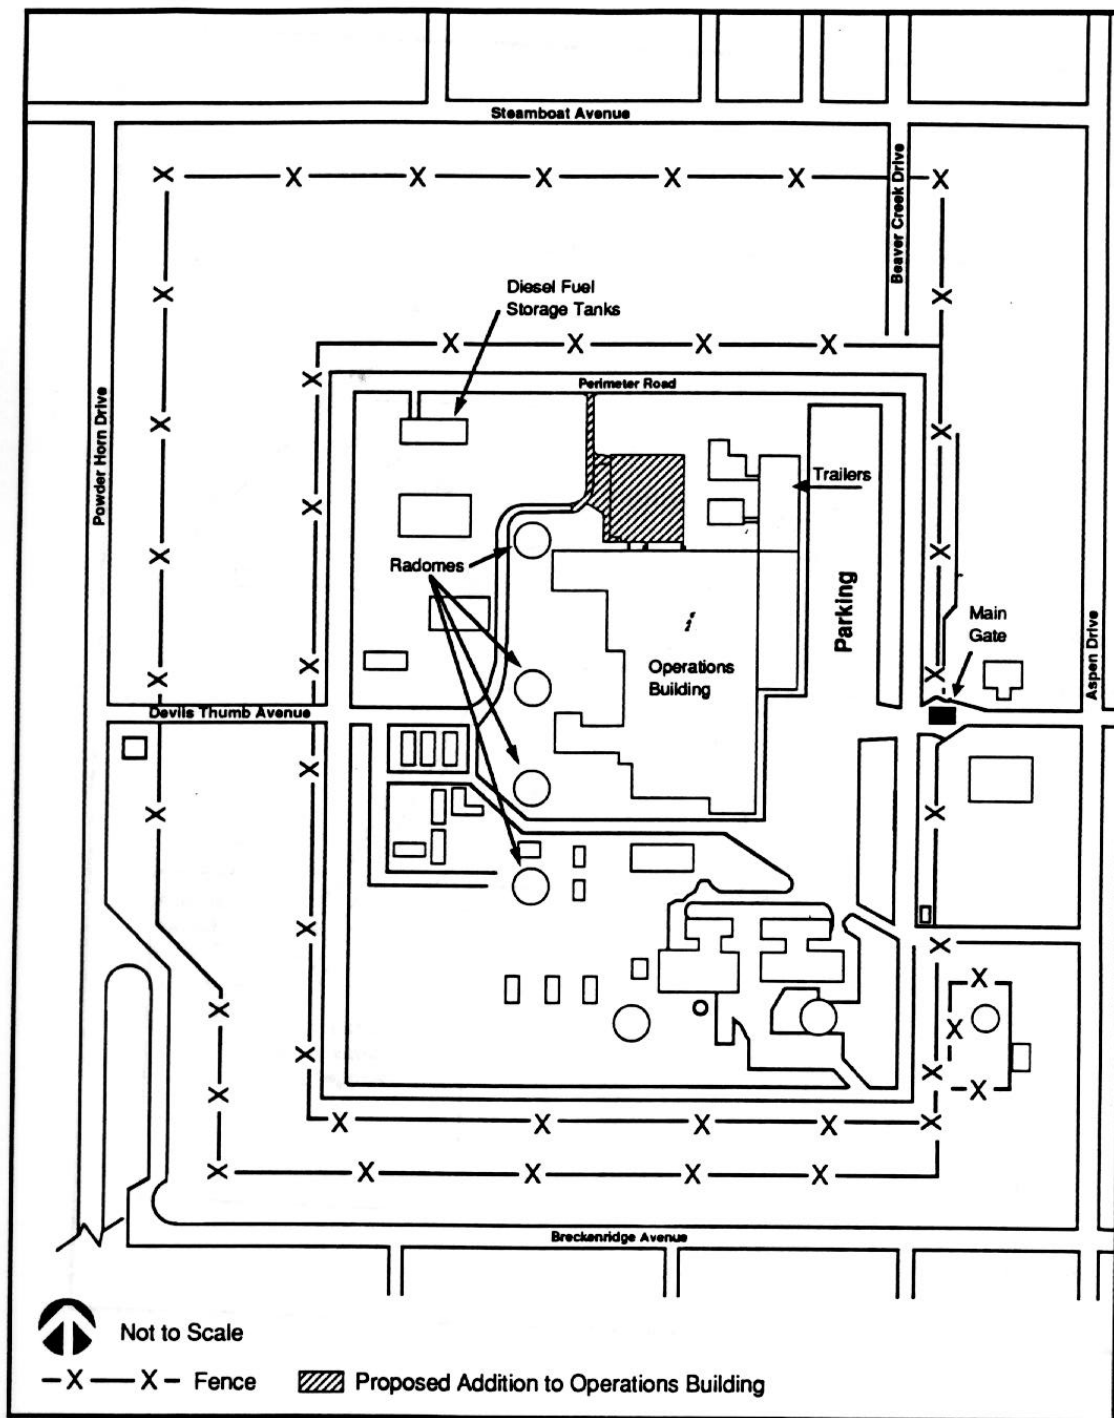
Aerospace Data Facility Site Plan and Proposed Addition
